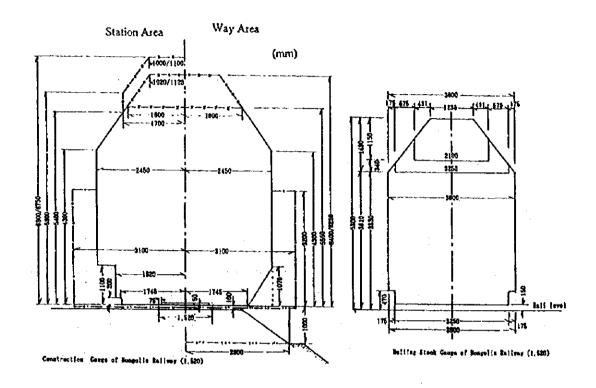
Construction Gauge and Rolling Stock Gauge
